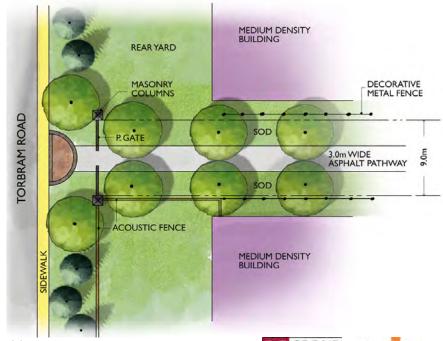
Street-to-Street 9.0m Wide Walkway Links on Torbram Road
